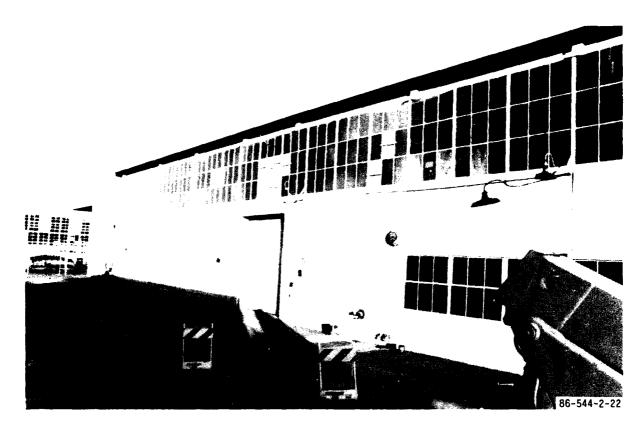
South side of Building 666 showing boarded-up broken windows, closed windows, and closed doors.
